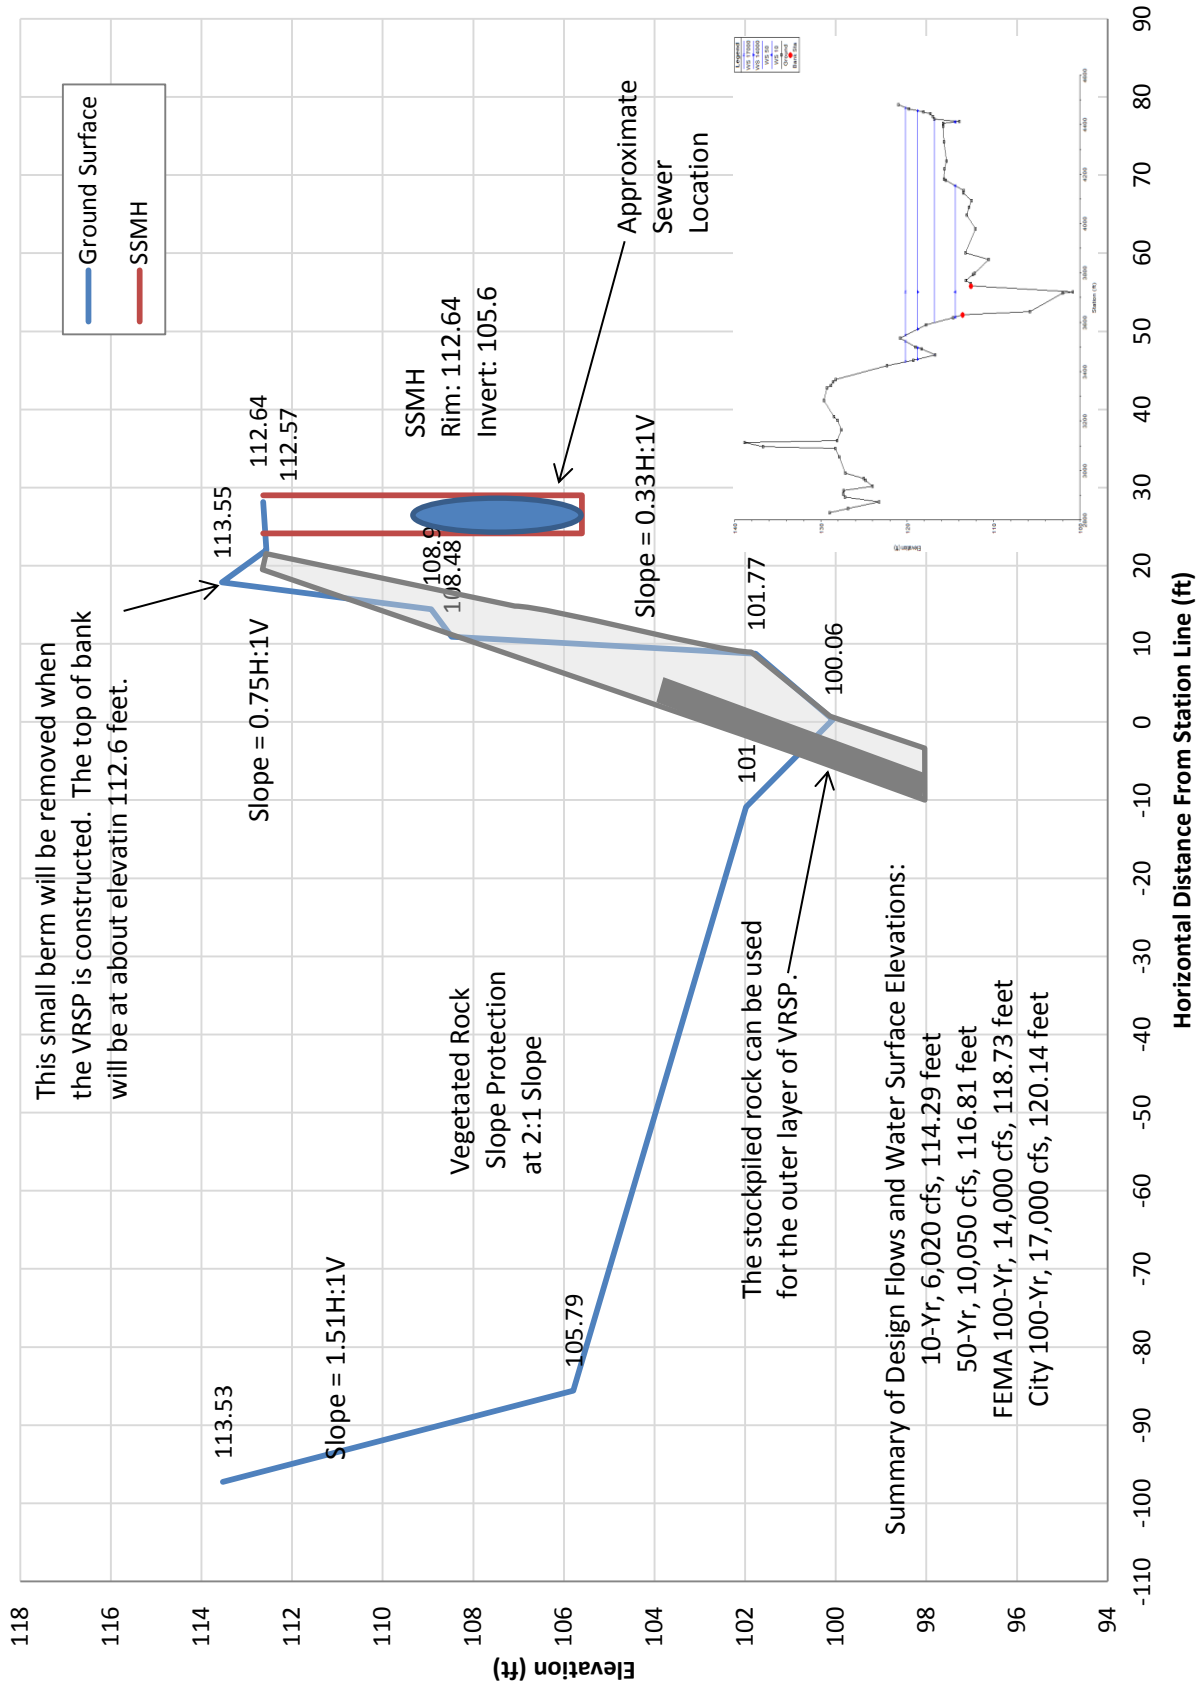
Surveyed Cross Section 7 (at HEC RAS Station 66740)
